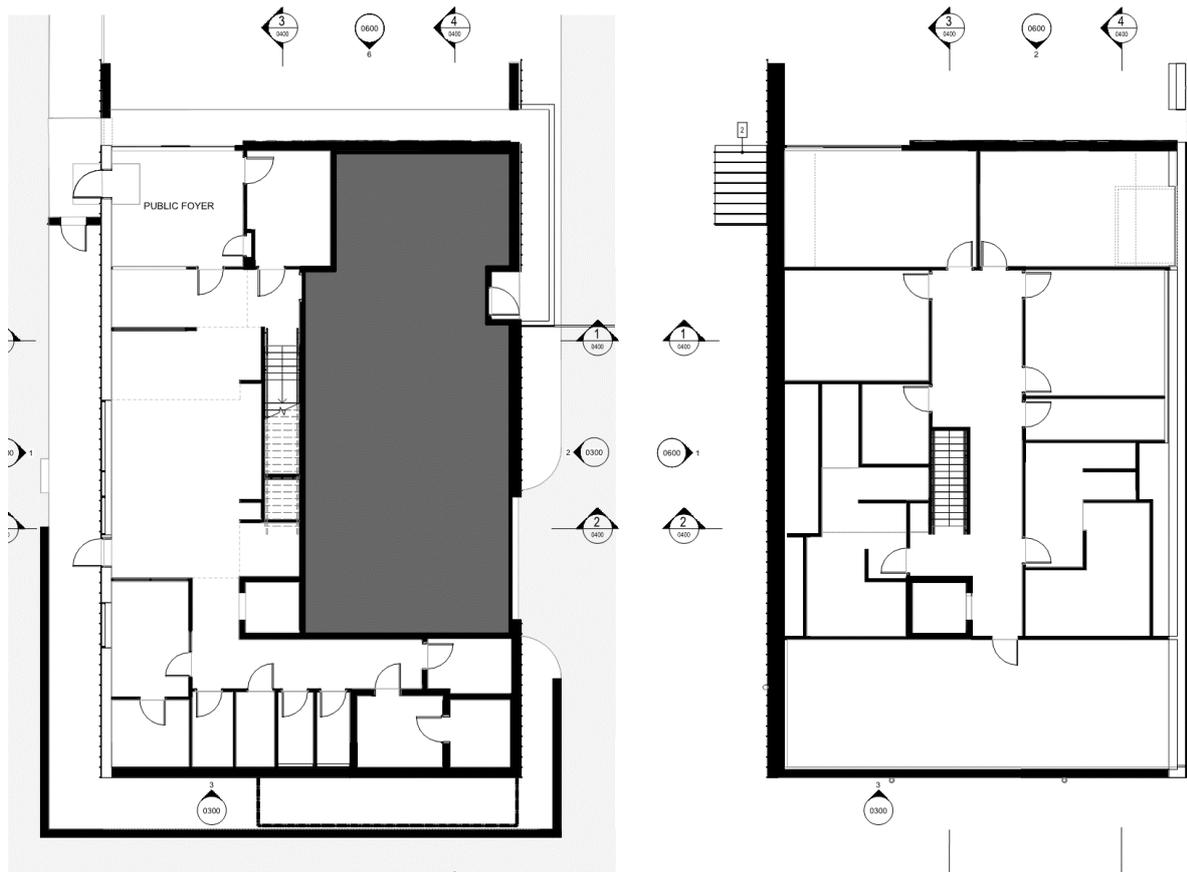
Proposed police station layouts for Ground Floor (left) and Level 1 (right).
